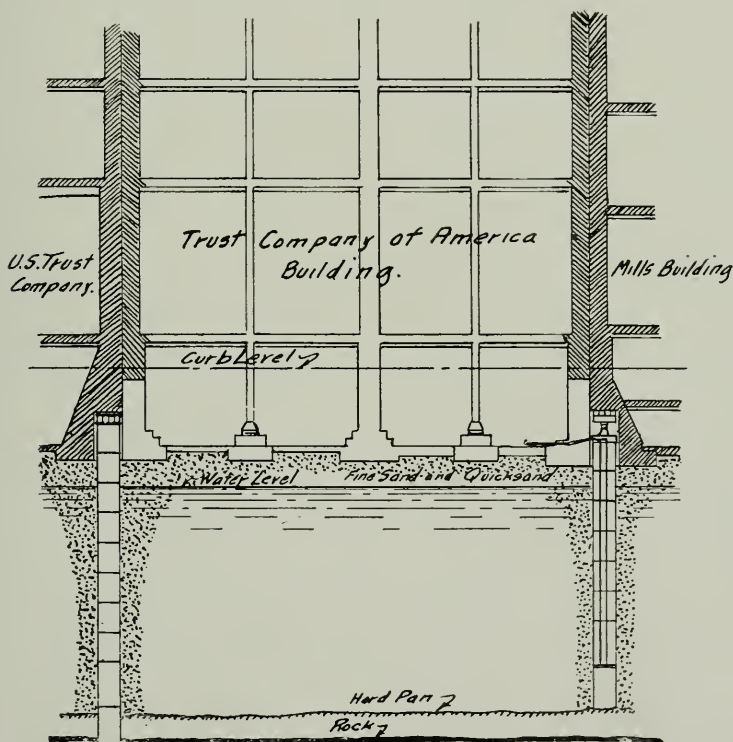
Showing how Pneumatic Caissons were used in underpinning the buildings adjacent to The Trust Company of America Building while the old building was being wrecked.
